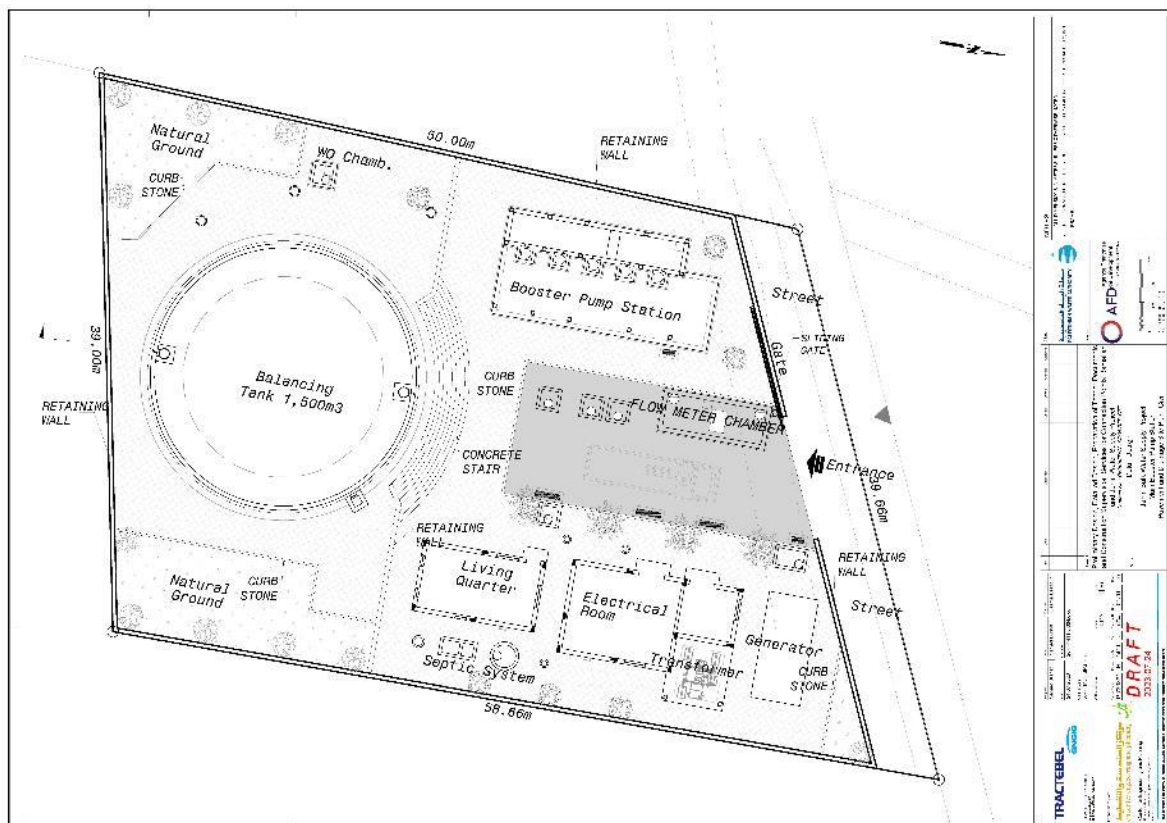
Facilities Layout of Al-Jalameh Main Booster Pumping Station (Source: Consultant)
